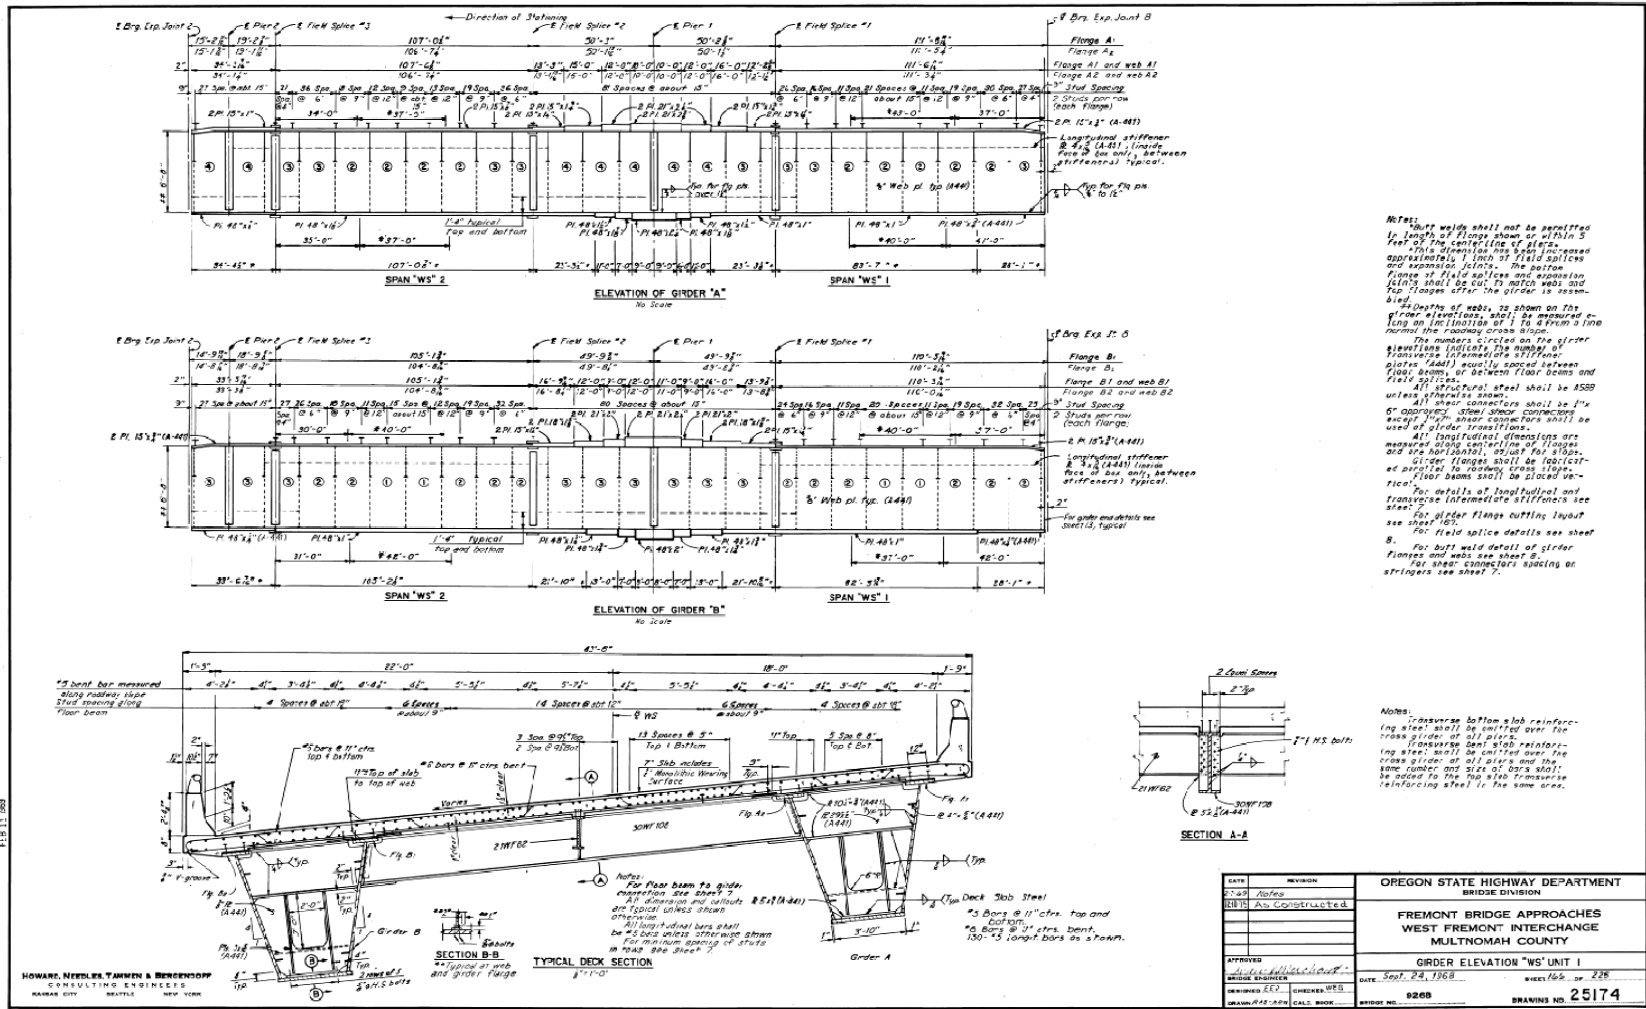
Structural details of WS Unit 1 Bridge superstructure 09268B.
